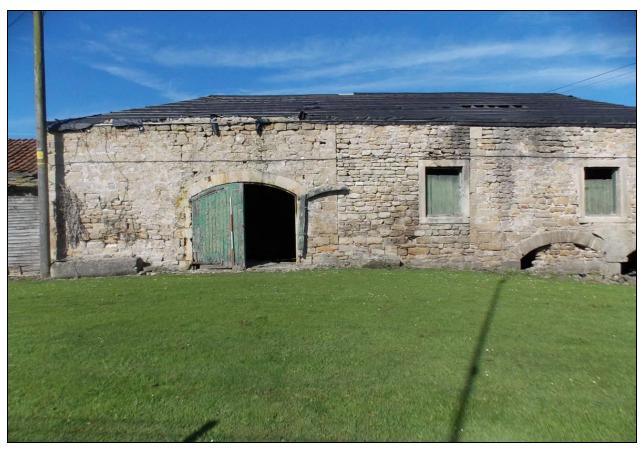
East elevation showing central opening blocked up and open-fronted basement in 2012, 2m scale.
